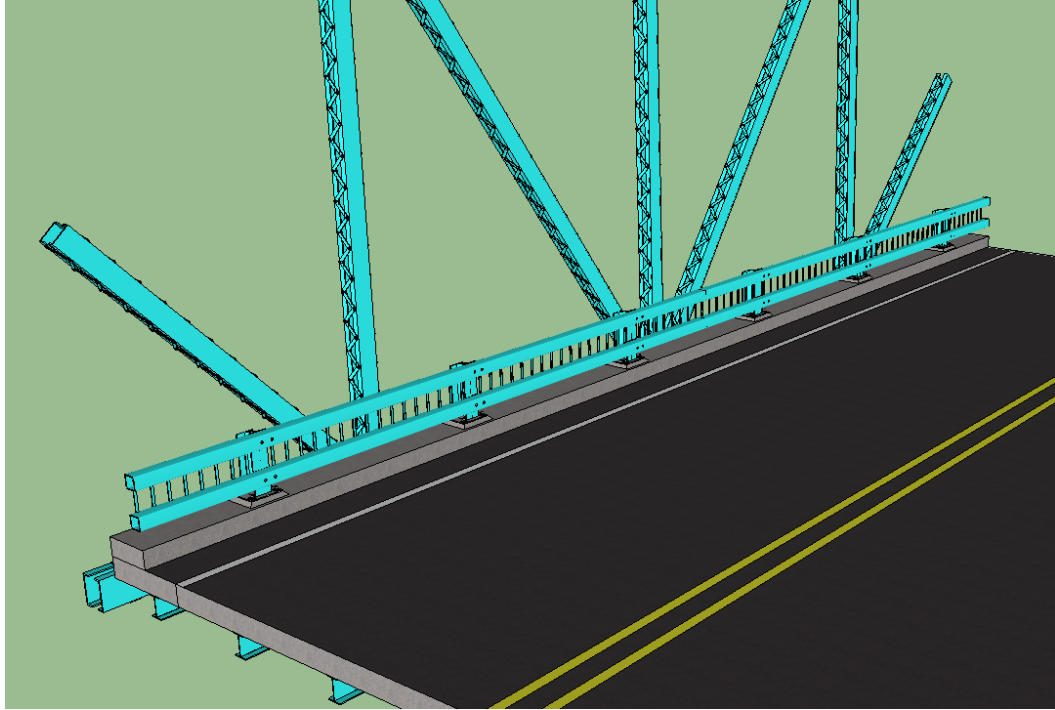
Metal thru truss with a railing ineligible for replication
